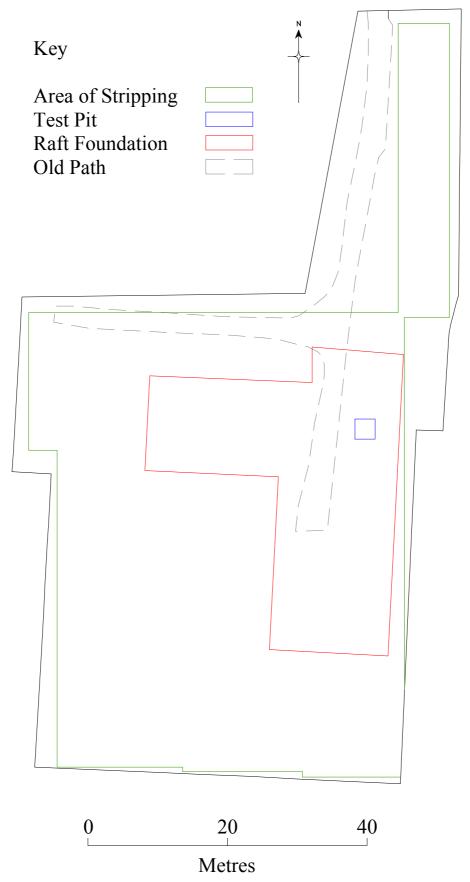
Plan showing the location of the encountered deposits in relation to the foundation trenches on the application site.
